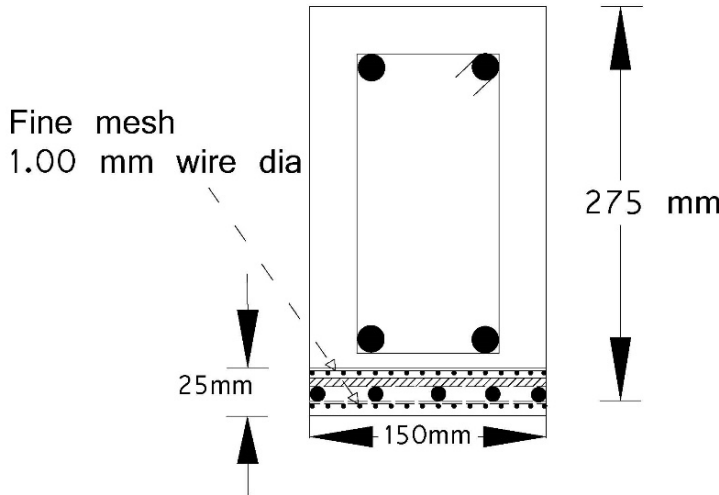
Typical section of strengthened beam for two and four layers of wire mesh
